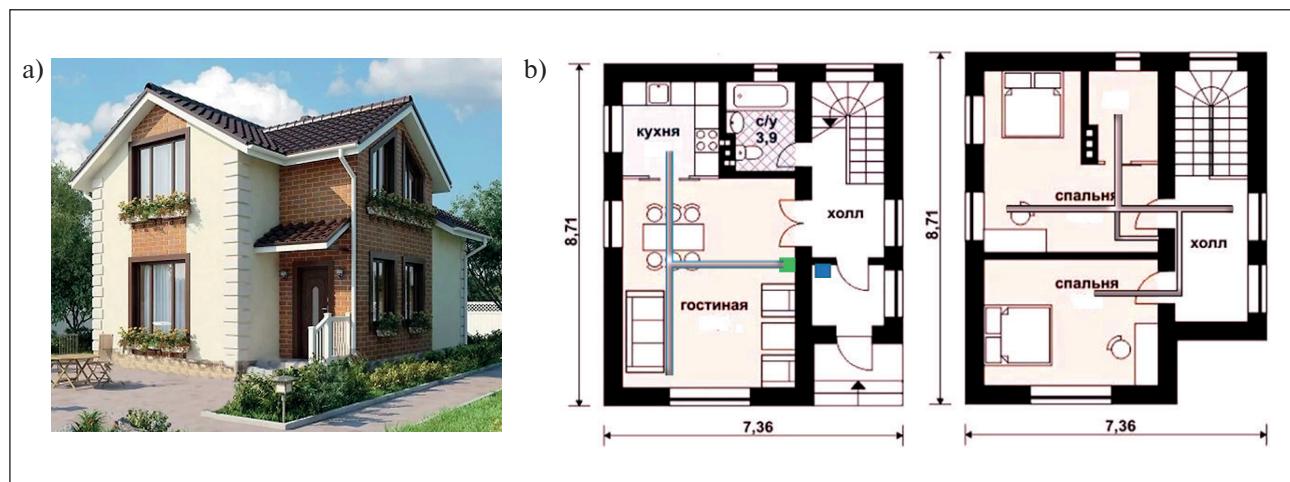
Individual residential building (a) and floor plans with EGWMDS and TMSA (b)
